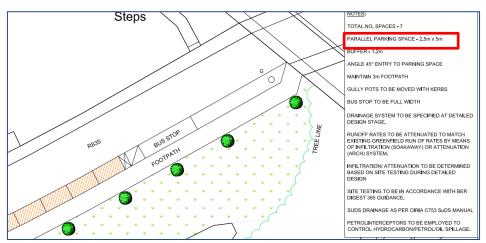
Proposed dimensions for parallel parking bays at Site A
